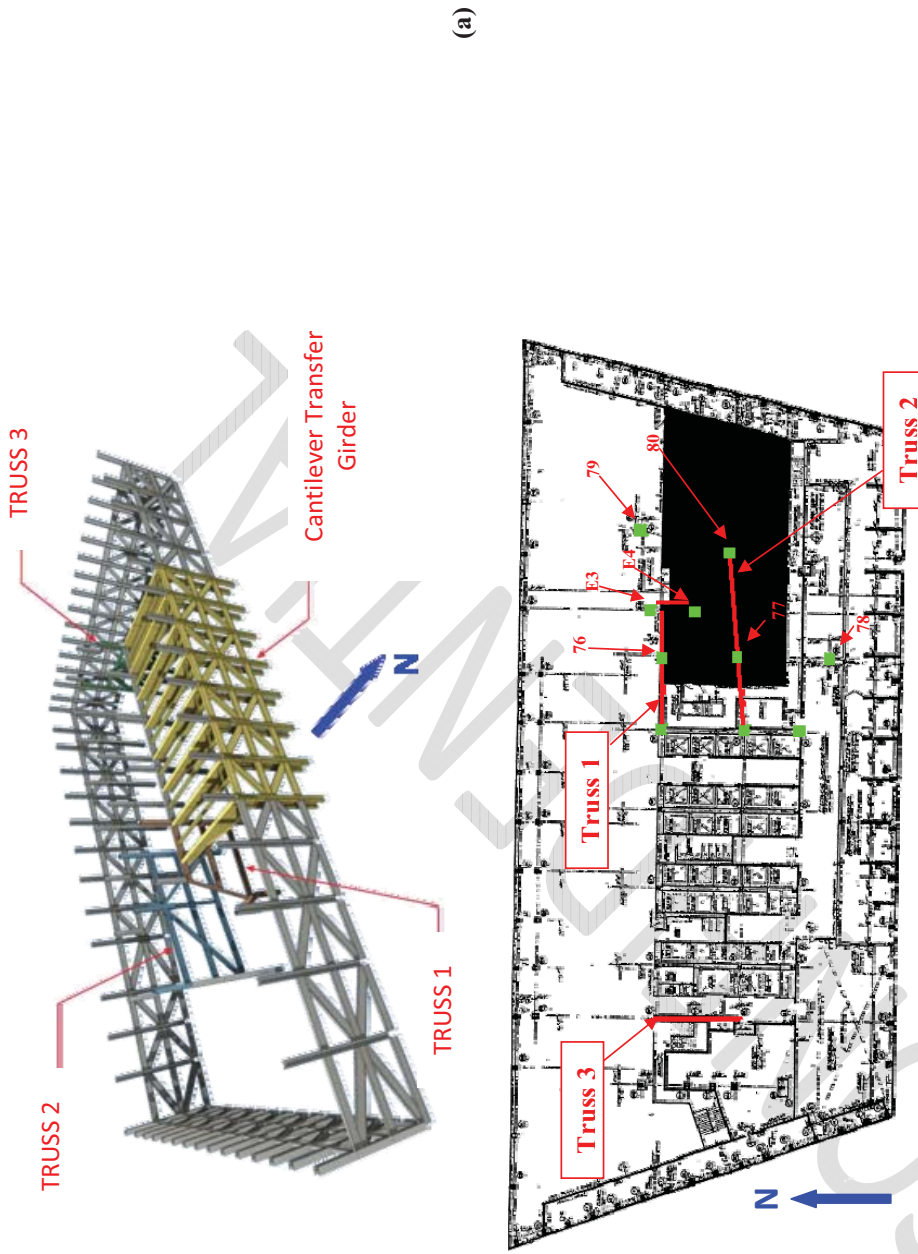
Schematic showing the location of Truss 1 and Truss 2. Figure 3(a) shows a three dimensional view of the structural elements without including the walls while Figure 3(b) shows a top view of the floor indicating the trusses in red, major columns in green, and the Mechanical Room in black.
